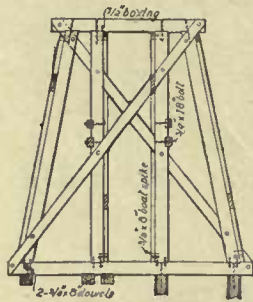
SECTION A B, SHOWING BRACING IN EMBANKMENT.
